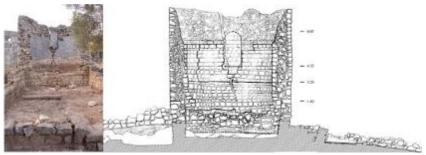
The east-west cross section (Myra-Andriake Excavations Archive 2009- Drawing E. Özkan)
